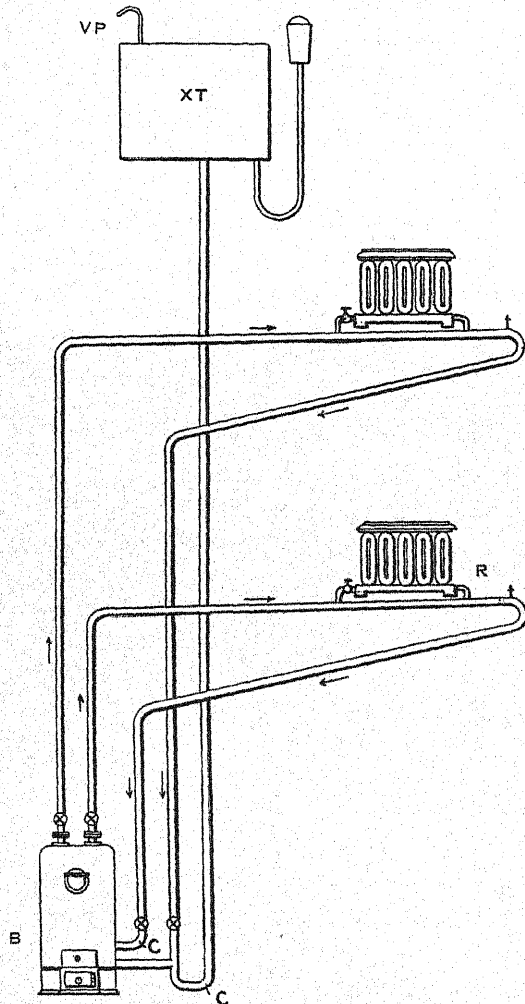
Elevation of Low-pressure Hot-water Apparatus, with Separate Circuit for Each Floor.
